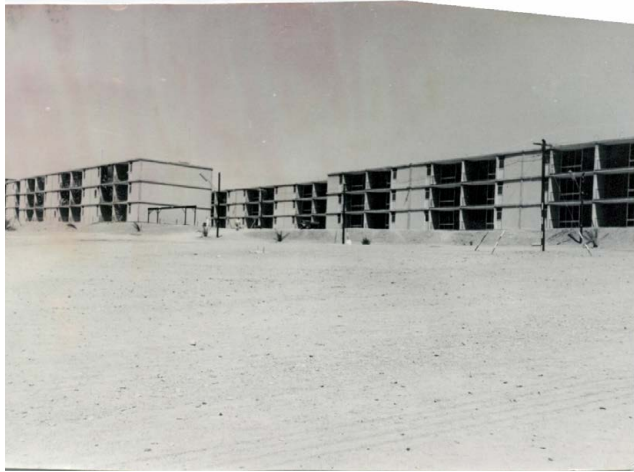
Construction of "tromin" buildings 1960. (Source: Eilat's archive)
